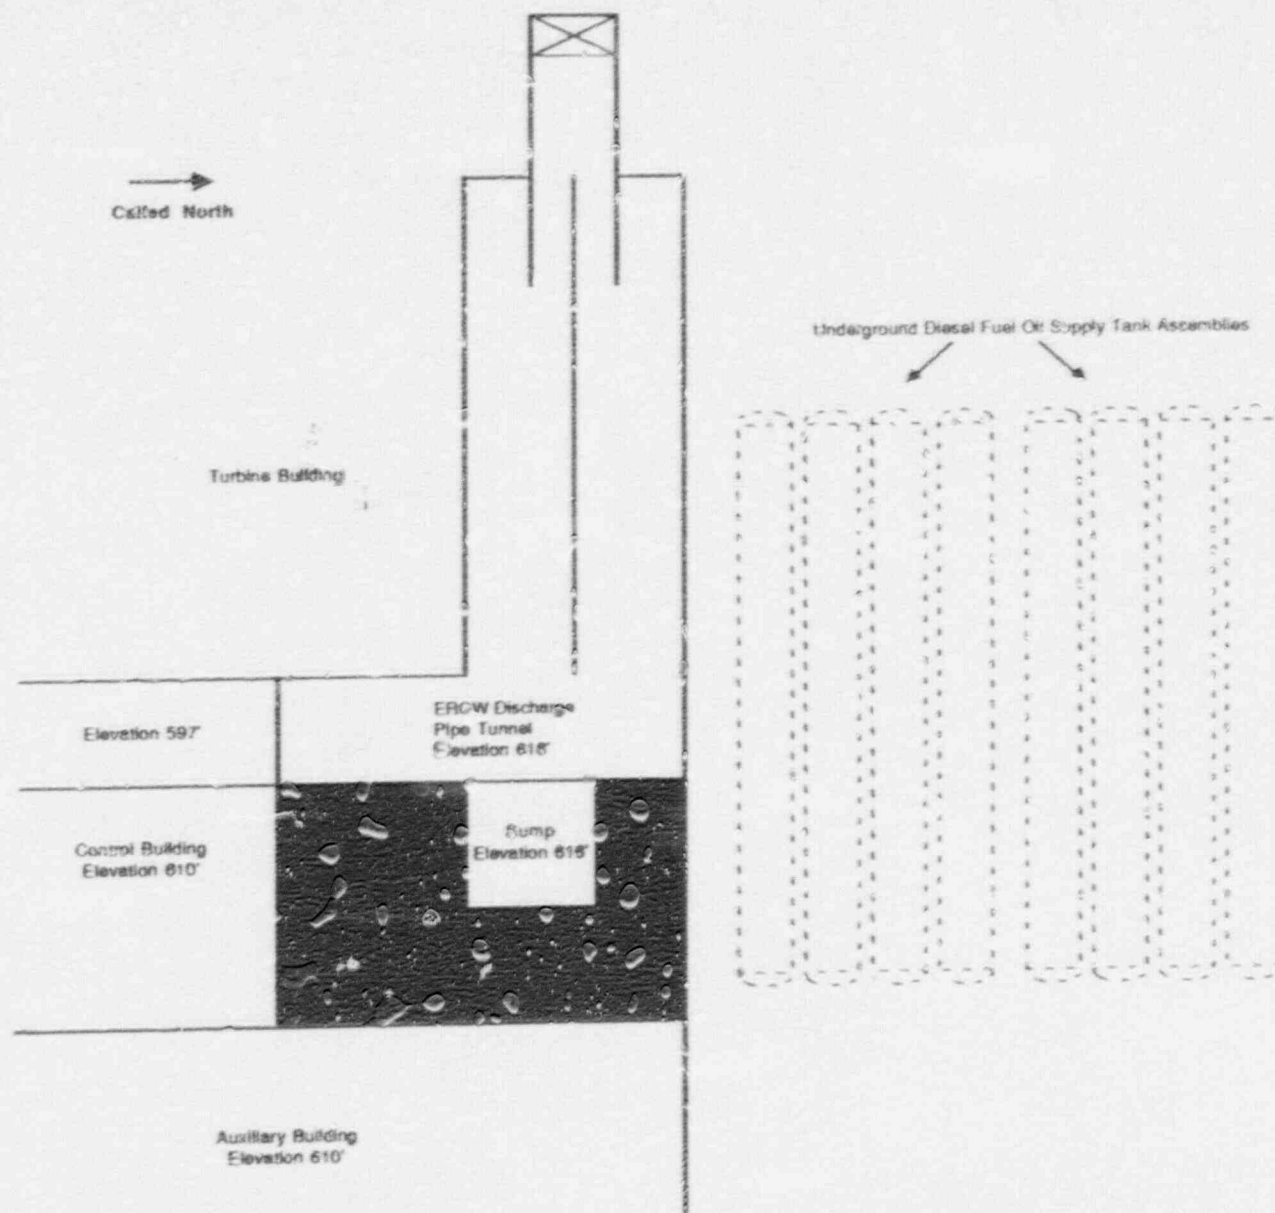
Bellefonte 1 Diesel Generator Building, Elevation 623'0"
